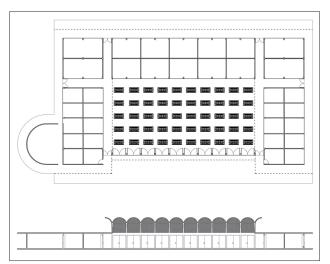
Floor plan and longitudinal section of the Market of Honduras. Source: Author.
